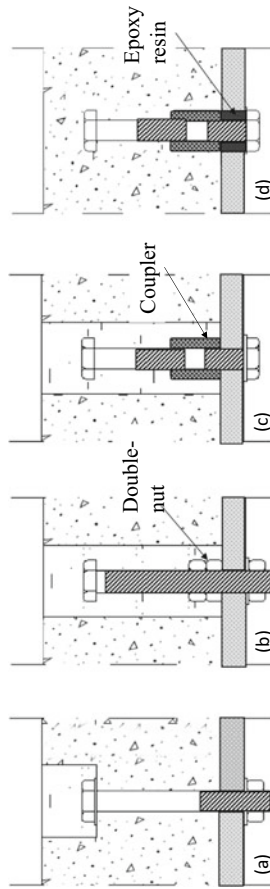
Types of demountable bolted connectors a friction grip bolts, b double-nut, c coupler system connectors, d injected bolted shear connectors with a coupler system
